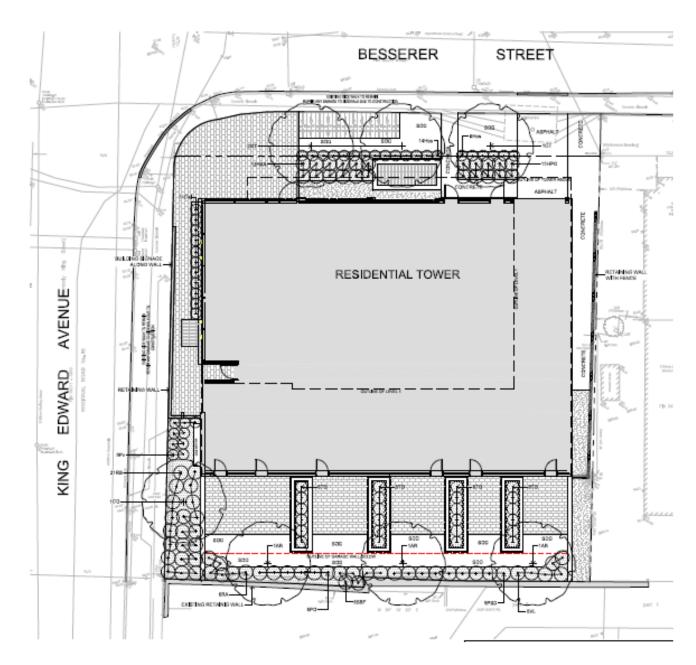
Ground level landscape treatment includes pavers with some shrub and planting beds, and a masonry wall extending from the rear property line north along King Edward Avenue returning into the building to conceal the proposed surface parking at the rear of the property with a green roof covering the area between the tower and the back of the property. Credit: Levstek Consulting 2019.
